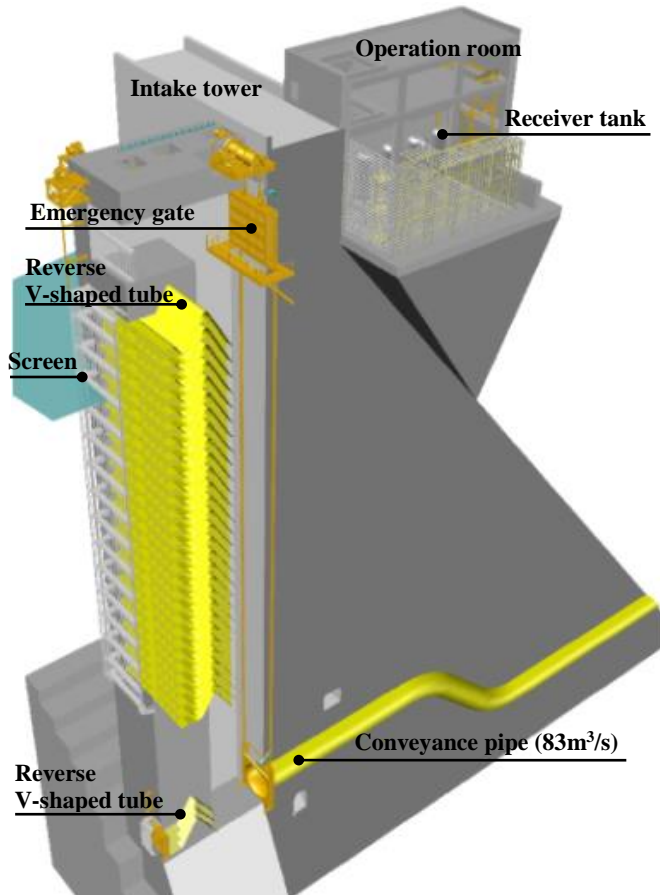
Outline Drawing of Yubari Shuparo Dam Intake Facilities
